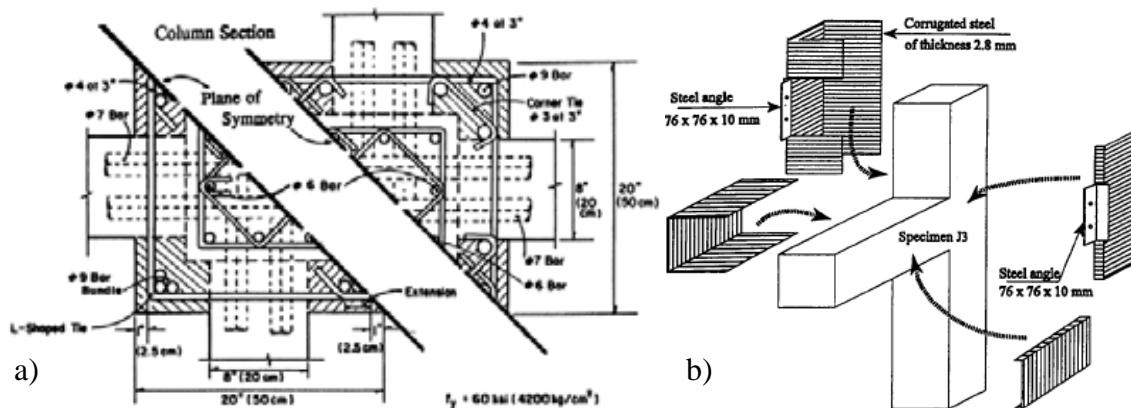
a) Reinforced concrete jacketing retrofit of interior beam-column joints [7]; b) Corrugated steel plates jacketing of exterior joints [76].
